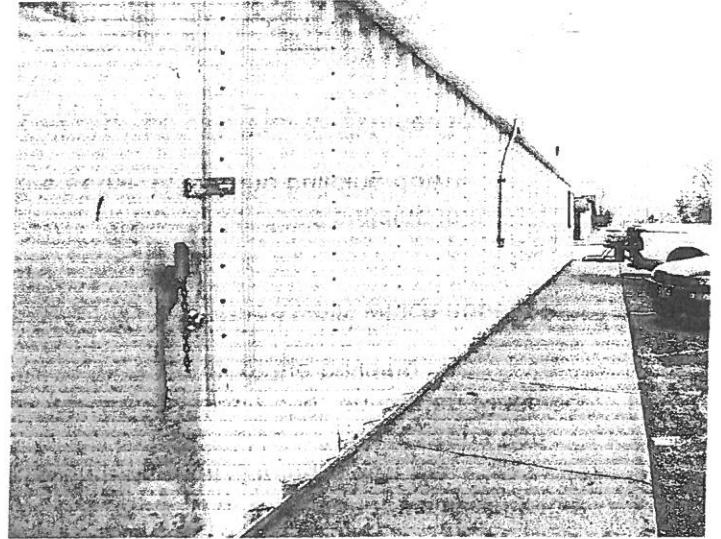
West Wall. The Lower Section Painted White Is a Repair of The Original Bottom of Wall.
